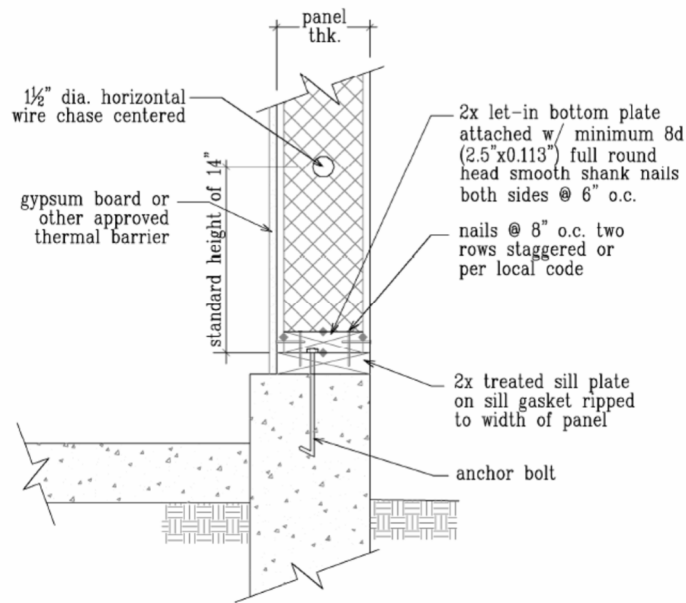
TYPICAL WALL PANEL ON FOUNDATION
